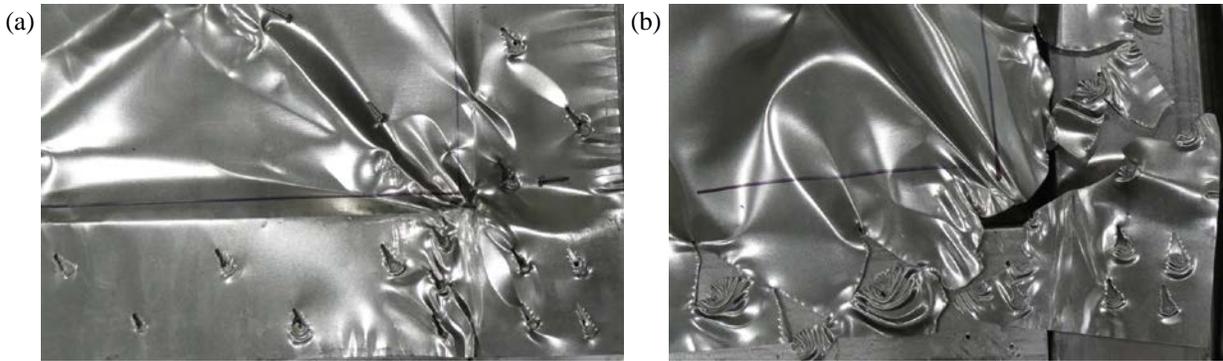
Bearing damage : (a) Specimen W36, (b) Specimen W37 with torn corner due to extensive drift demand
